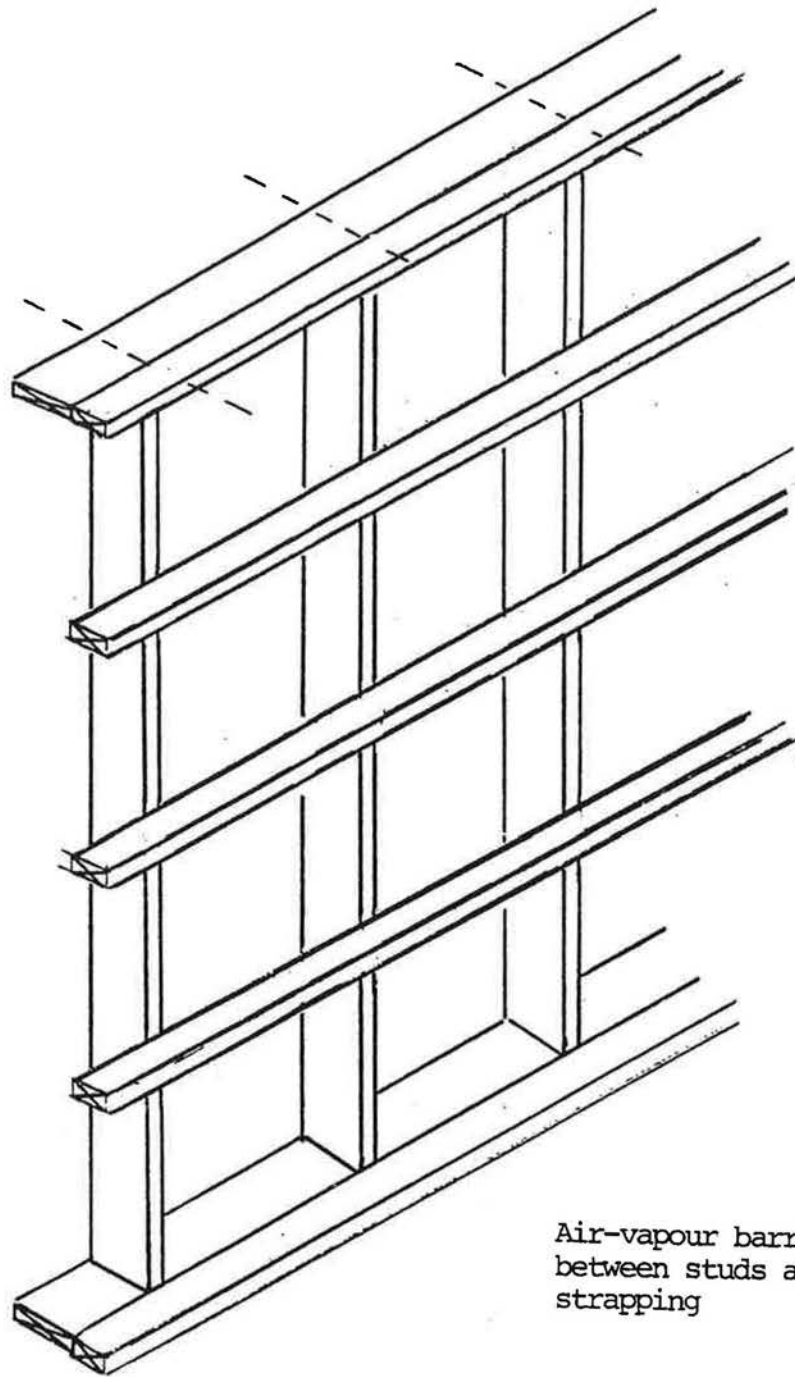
2 x 6 Wall construction incorporating exterior insulation
